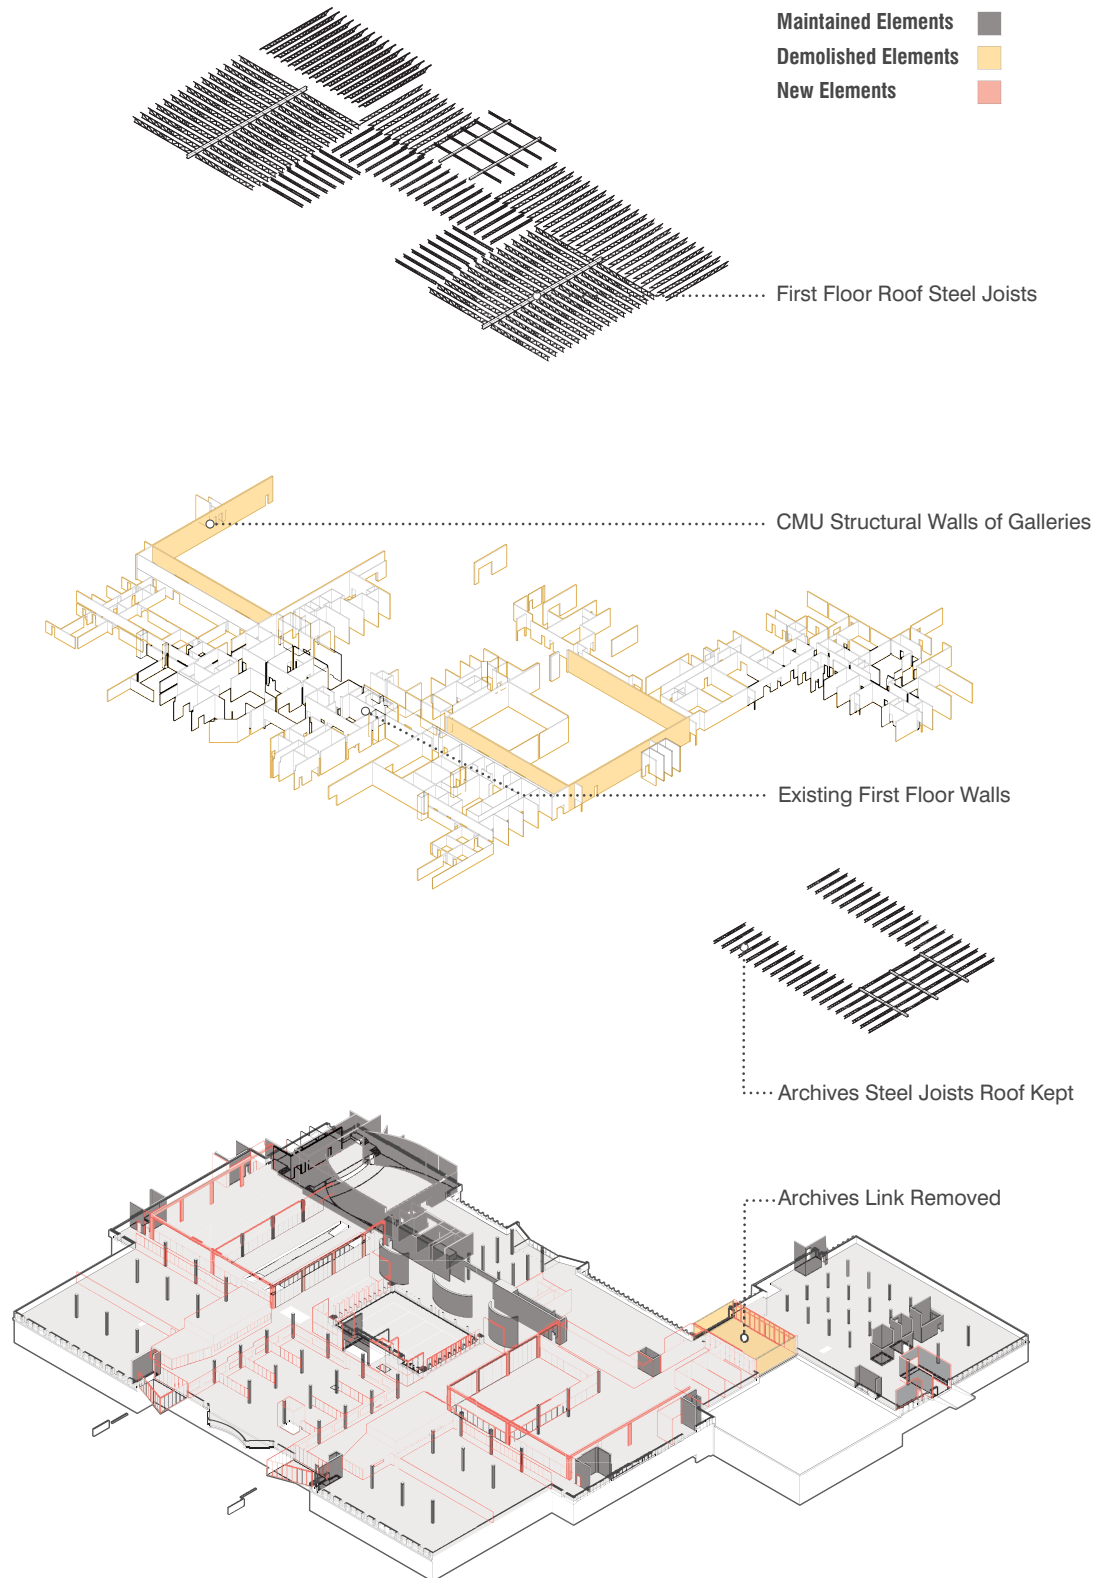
Isometric diagram exhibiting existing and new elements of the first floor
